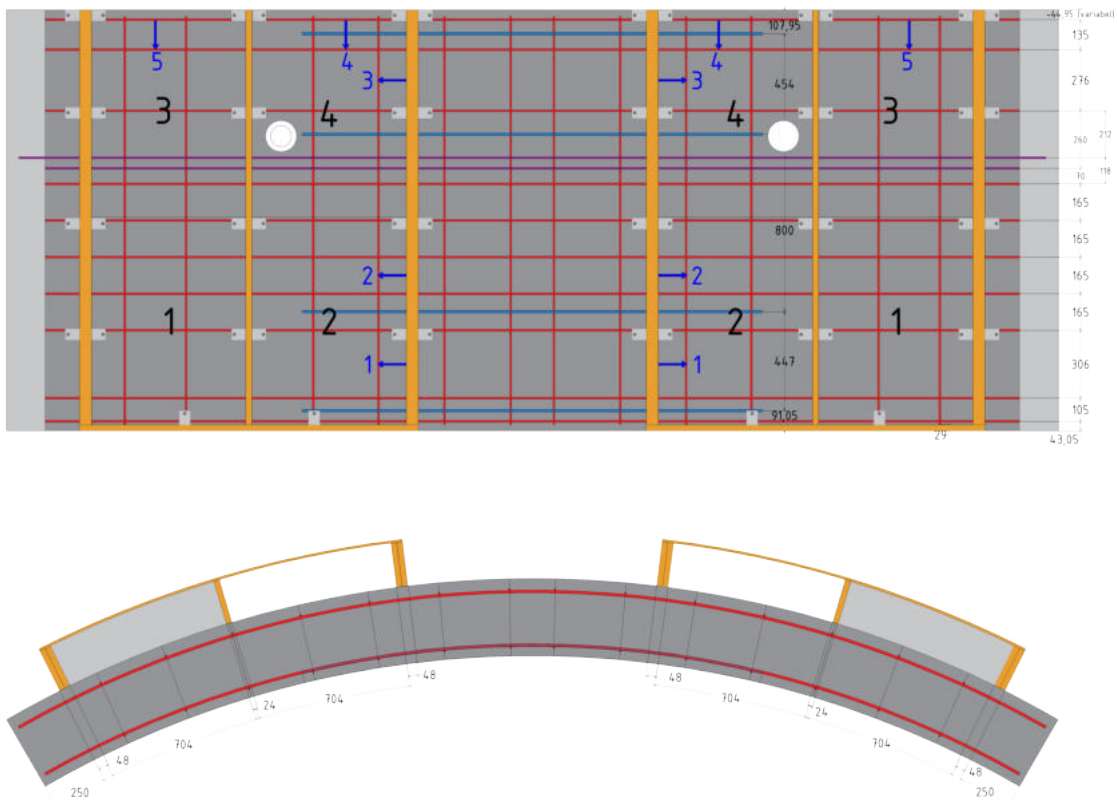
Reinforcement plan and measuring tracks of the segment type A with wooden formwork and chamber numbering. Top: front view towards the interior surface of the segment (formwork boundaries and metal mounting brackets illustrated on inner surface); Bottom: top view of the segment.
